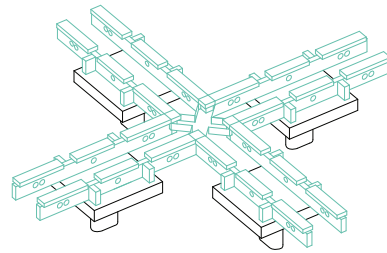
1. underground foundations (J.Lim, 2017)
